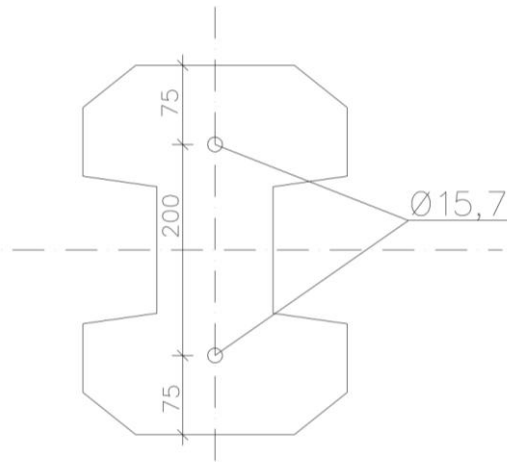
Arrangement of prestressing cables of prestressed concrete column and prestressed steel fibre reinforced concrete column
